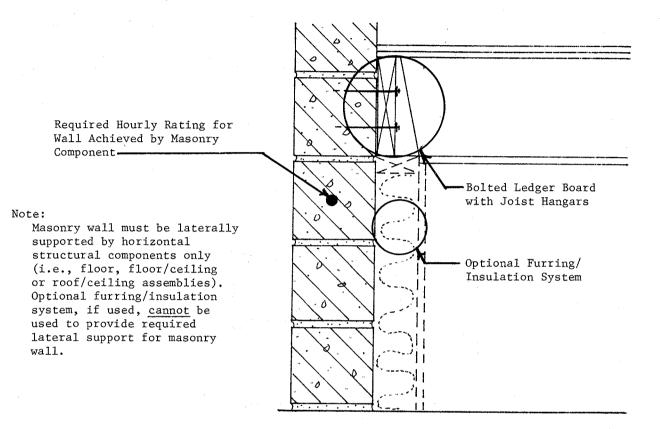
Single Wythe Masonry Wall (Bearing Condition)
